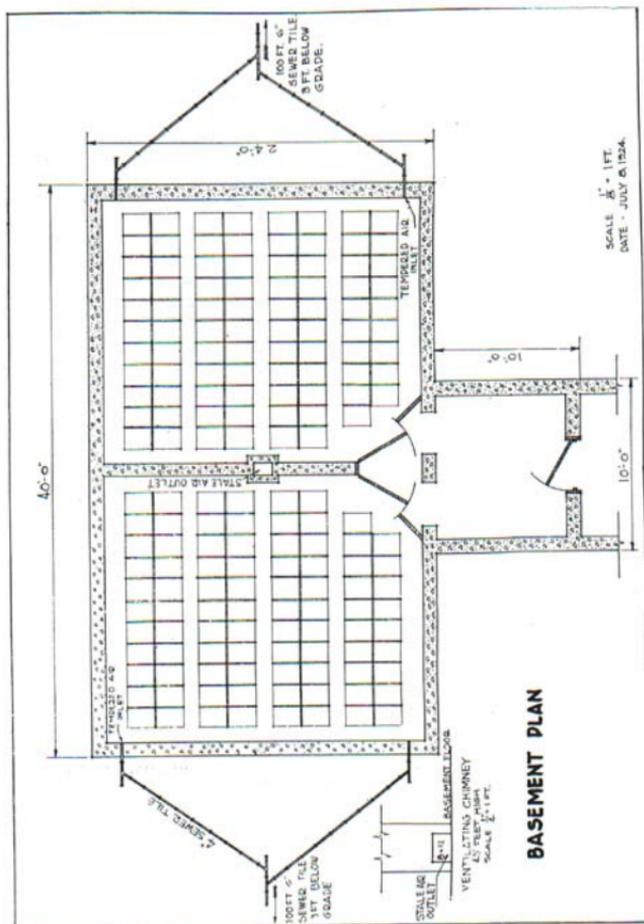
Floor plan and arrangement of ventilators for a bee-cellar.
